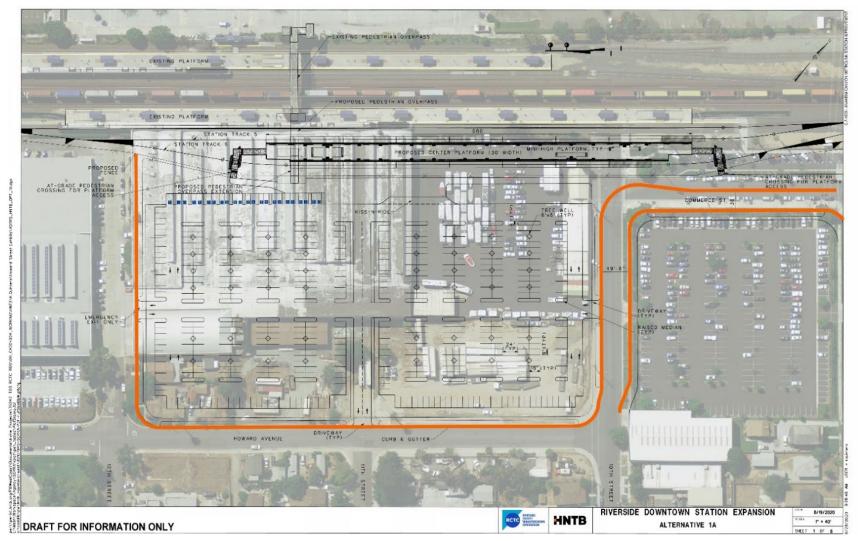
Build Alternative with Pedestrian Overpass Access Design Option 1 *Source: HNTB 2020
